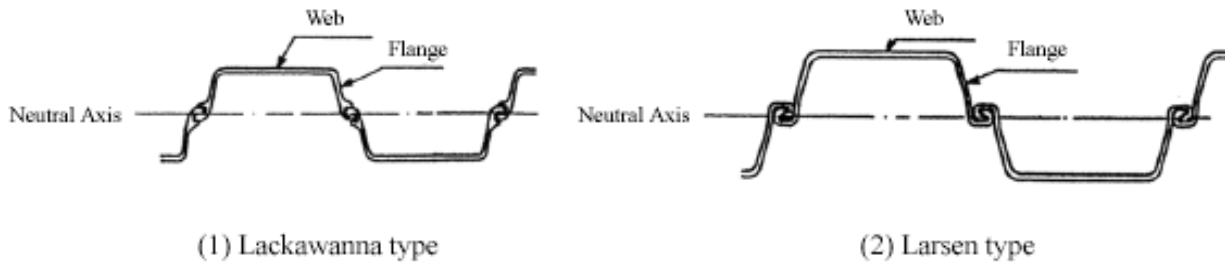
Typical configuration of U-shaped steel sheet pile sections (website of Atlantic Sheet Pile, Inc.)
